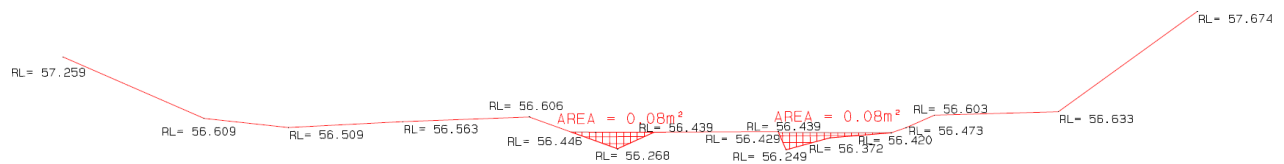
SBT5 Discharge Site – Thompsons Creek Survey Cross Section
